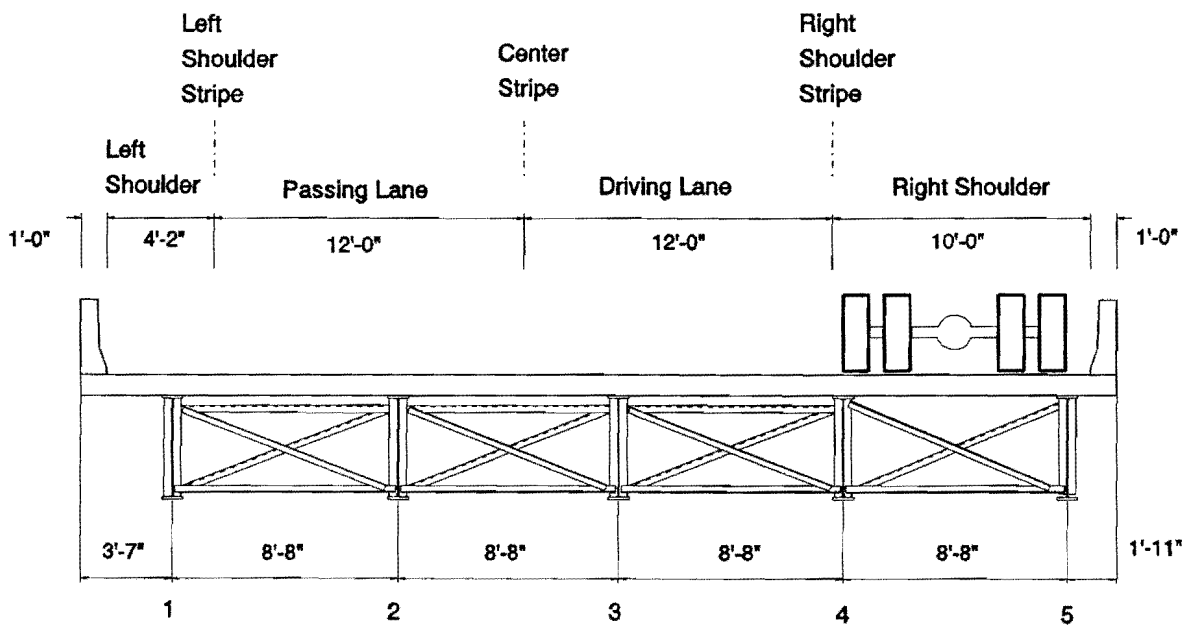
Location for test truck positioned in center of right shoulder lane.
